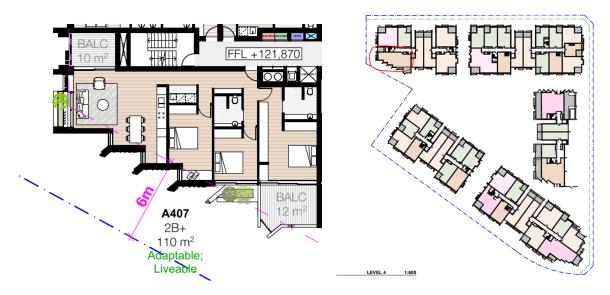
Unit A407 Floor Plan and Apartment mix diagram for Level 4
